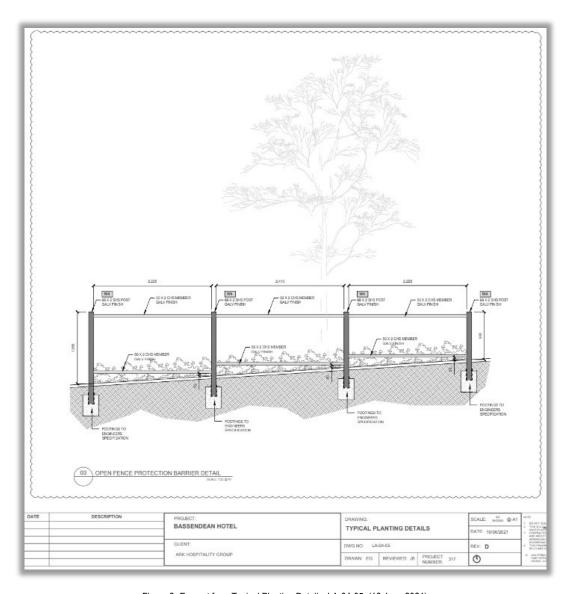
Excerpt from Typical Planting Details, LA-04-05. (16 June 2021).
